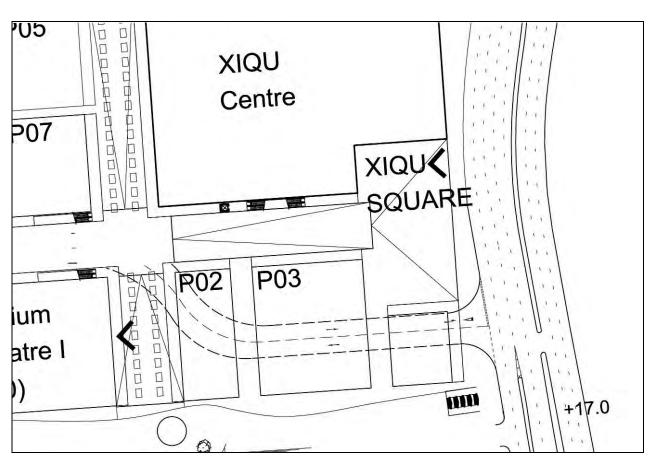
Proposed Junction Layout of Austin Road West/Nga Cheung Road (Elevated)Access to WKCD (WK1)
